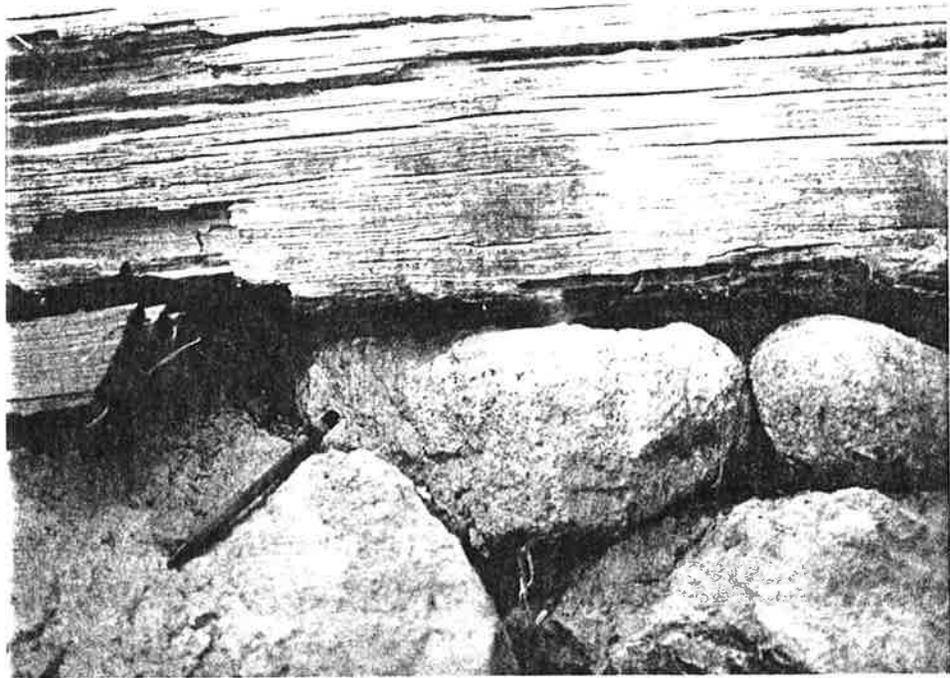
Birch Creek chicken house, interior view of typical sill deterioration along south wall near southeast corner. (Neg. R2-19)
